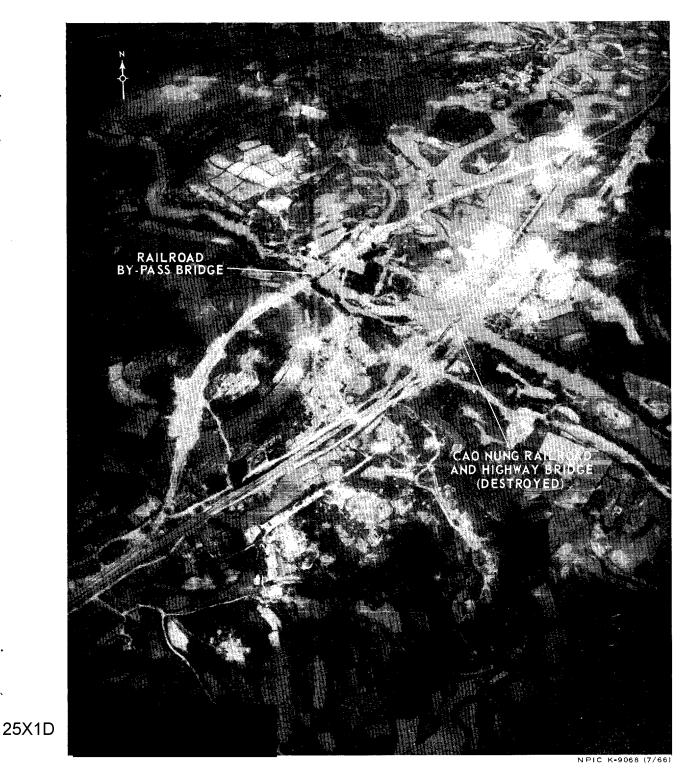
RAILROAD BY-PASS BRIDGE, HA NOI/PING-HSIANG RAIL LINE, NORTH VIETNAM
